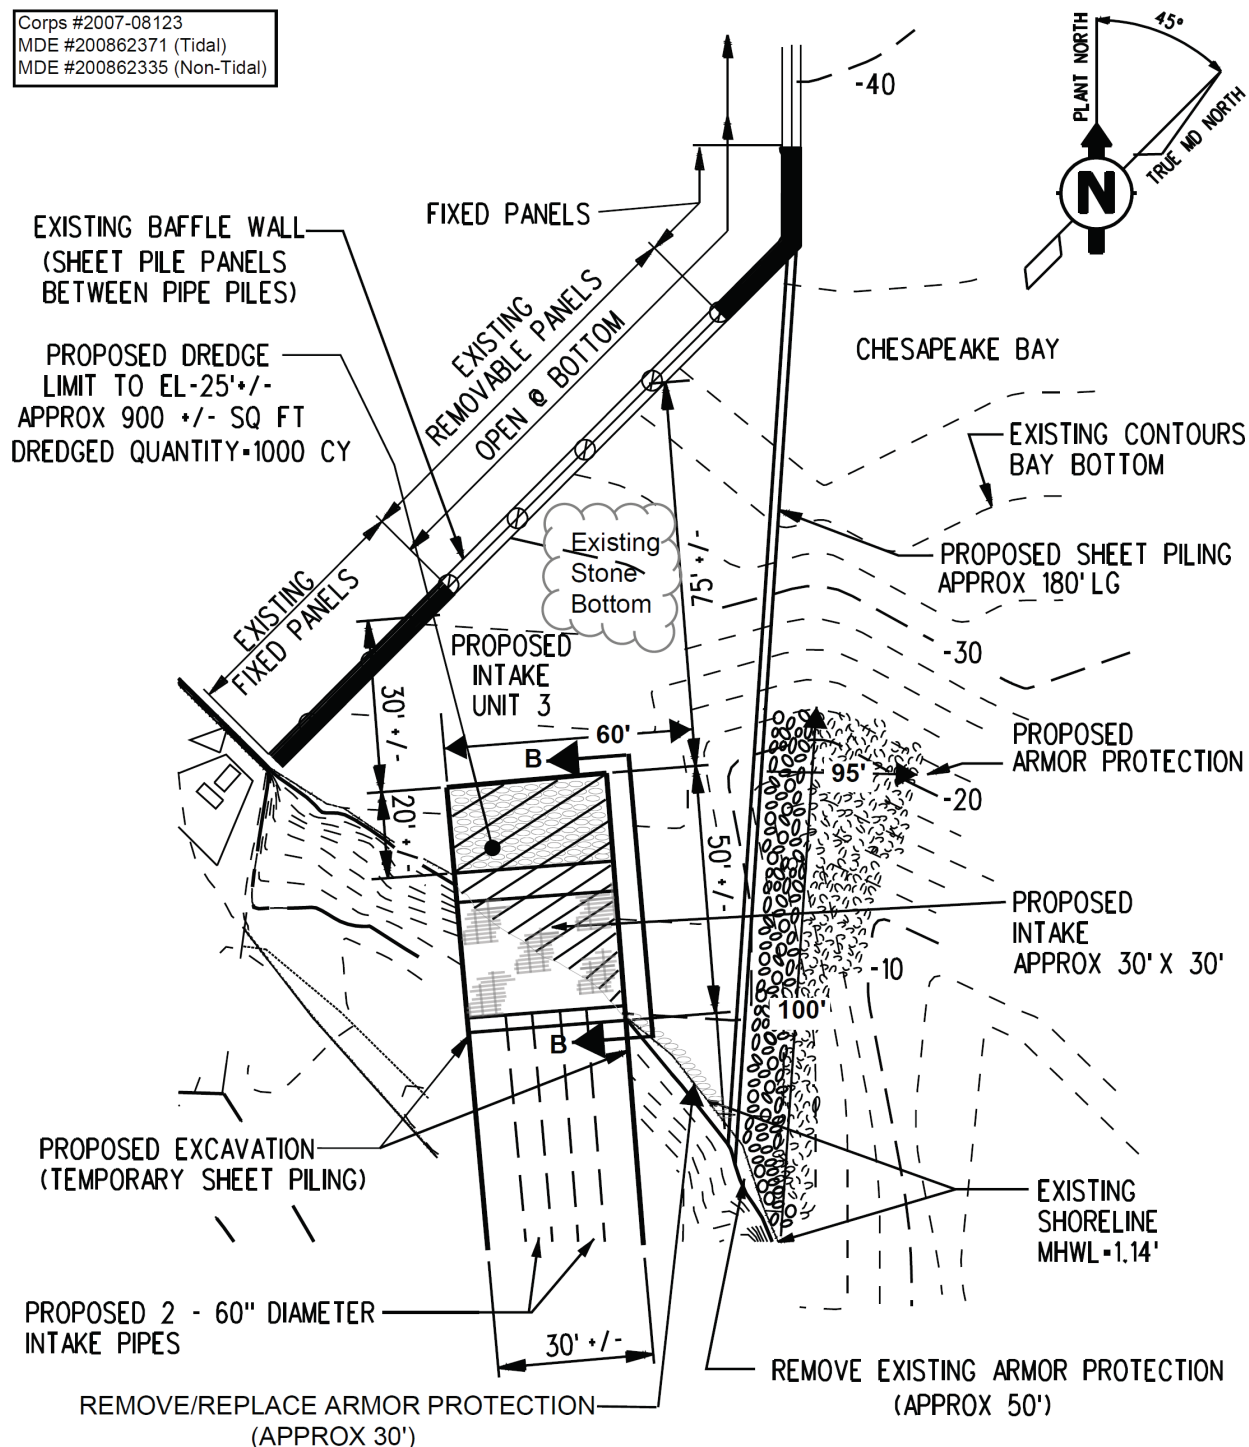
Site Plan at Unit 3 Intake Structure (USACE 2011)
